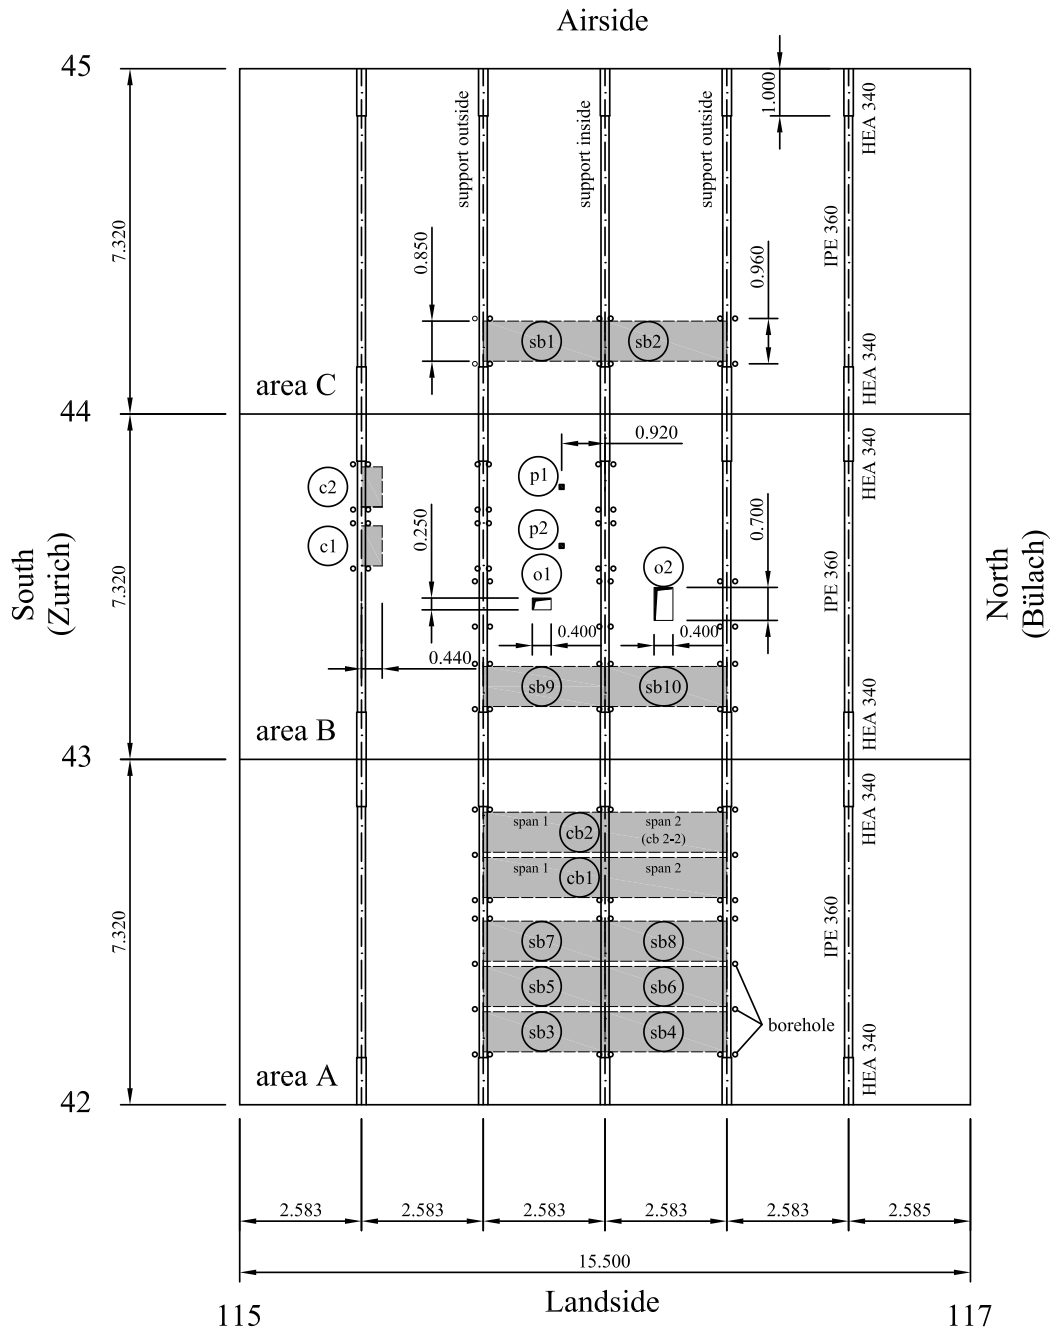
Location of the different test specimen within the area used for testing (sb: single beam, cb: continuous beam, c: cantilever, p: punching, o: opening). All dimensions in [m].
